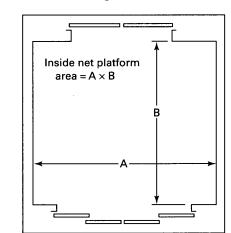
Inside Net Platform Areas for Passenger Elevators
